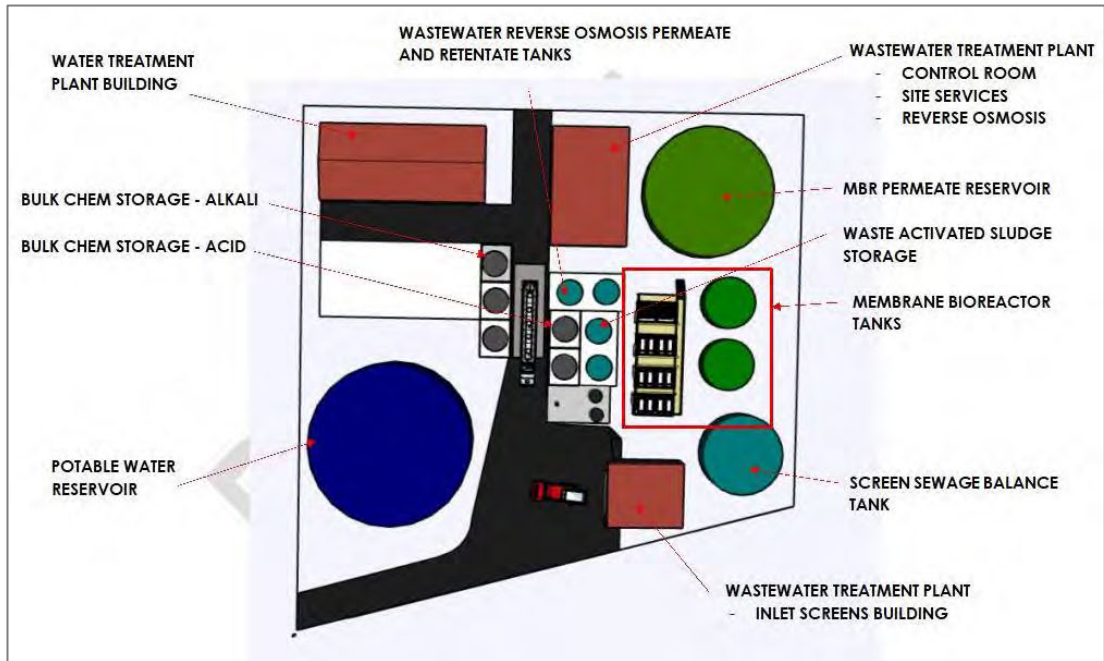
Wastewater Treatment Plant Compound Site Plan. Source: Apex Water.
